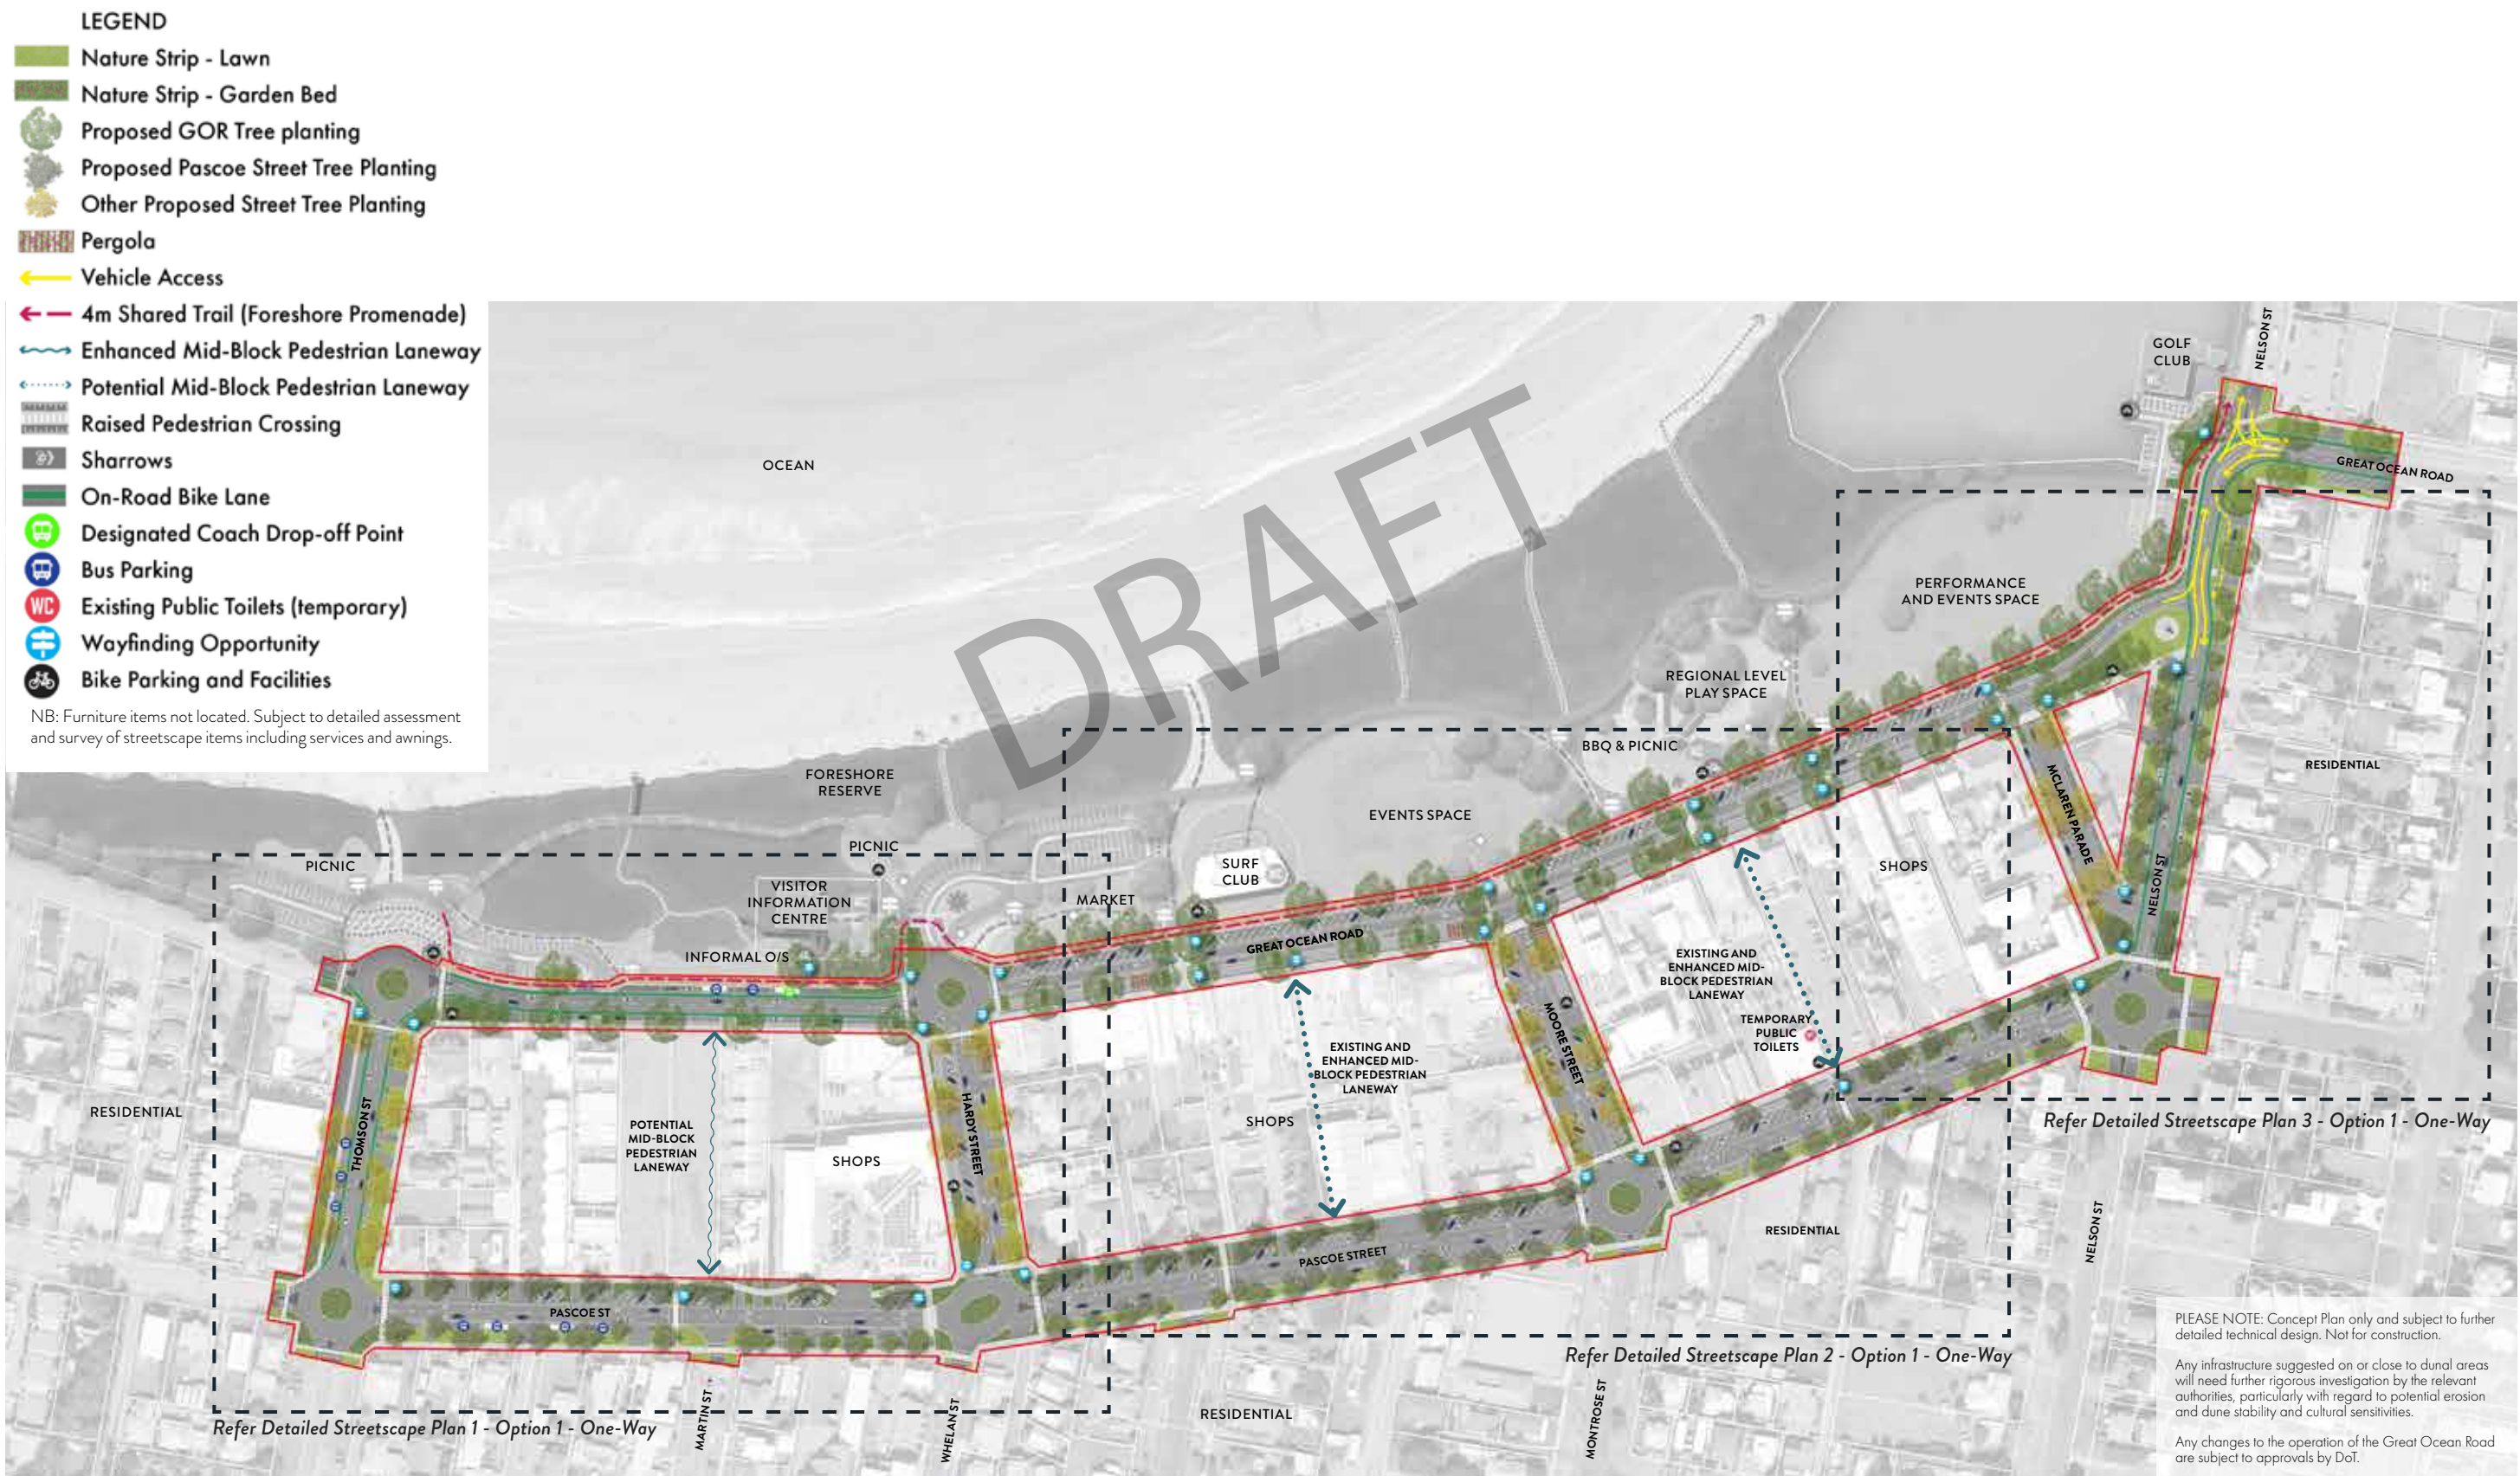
Overall Streetscape Plan - Option 1 - One-Way
